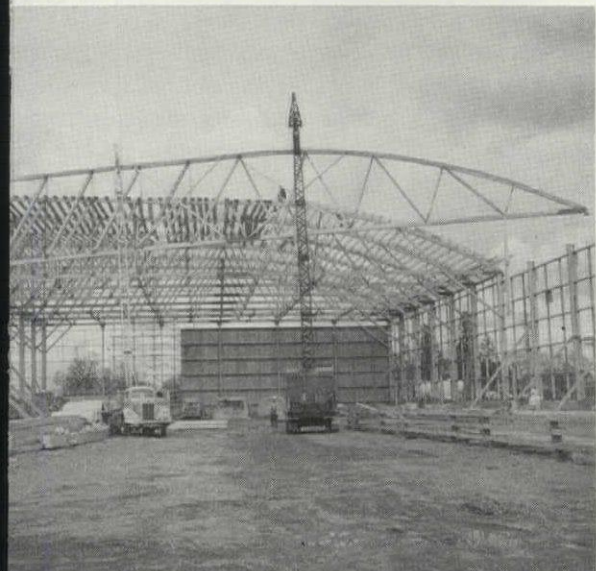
THESE 120 FT. SPAN MODIFIED BOWSTRING TRUSSES IN AMERICAN CAN CO. WAREHOUSE, PERMIT MULTIPLE SPANS WITHOUT BUILT-UP VALLEYS.
